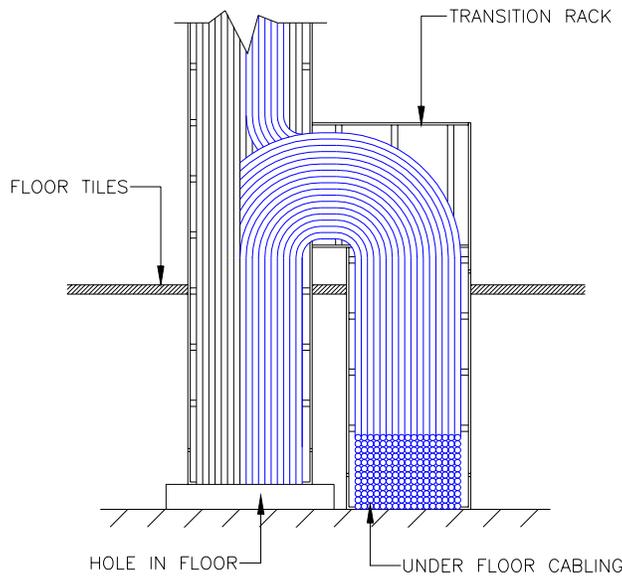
F – Cable Transition Arrangement – Existing Cable Holes To Other Floors
